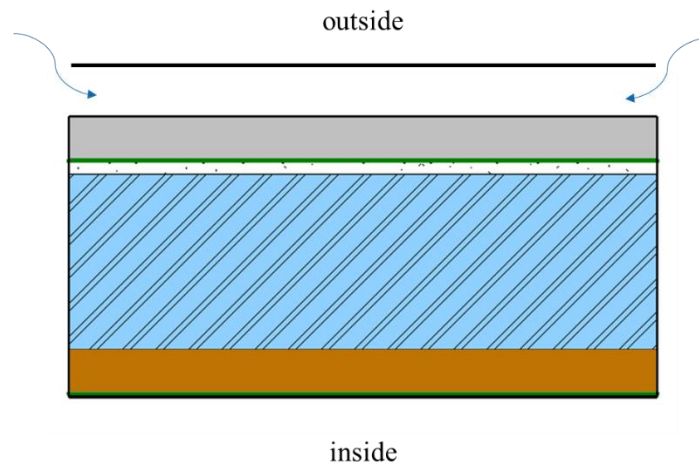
Wall composition after thermal retrofit (Alternative 1). From inside to outside: clay-gypsum plaster, straw panel, masonry brick, plaster, fiberglass mats, rear ventilated façade
